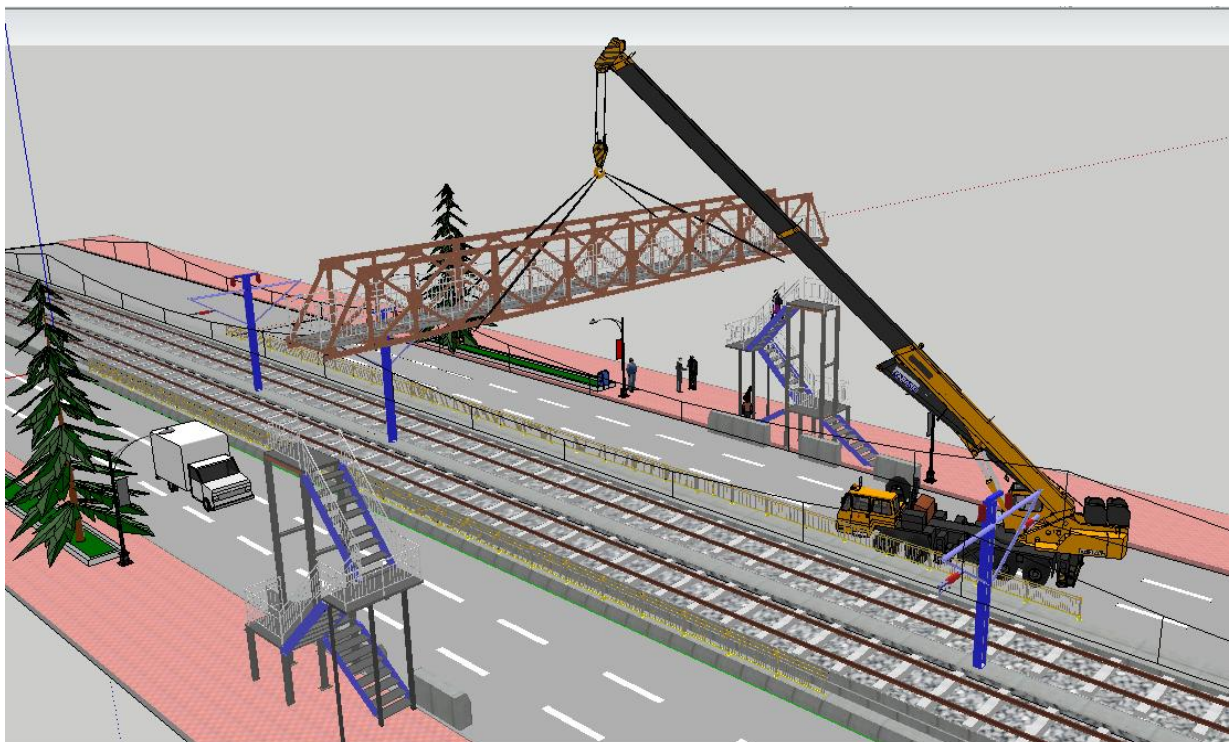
3D Model of lifting the truss bridge using Terrain crane
